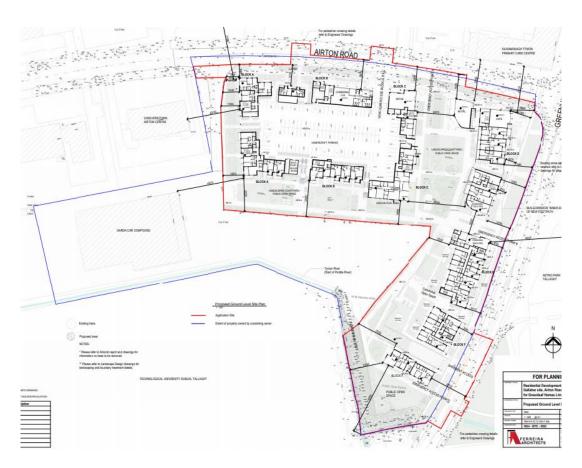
Ground floor layout plan approved under ABP Ref. ABP-306705-20
